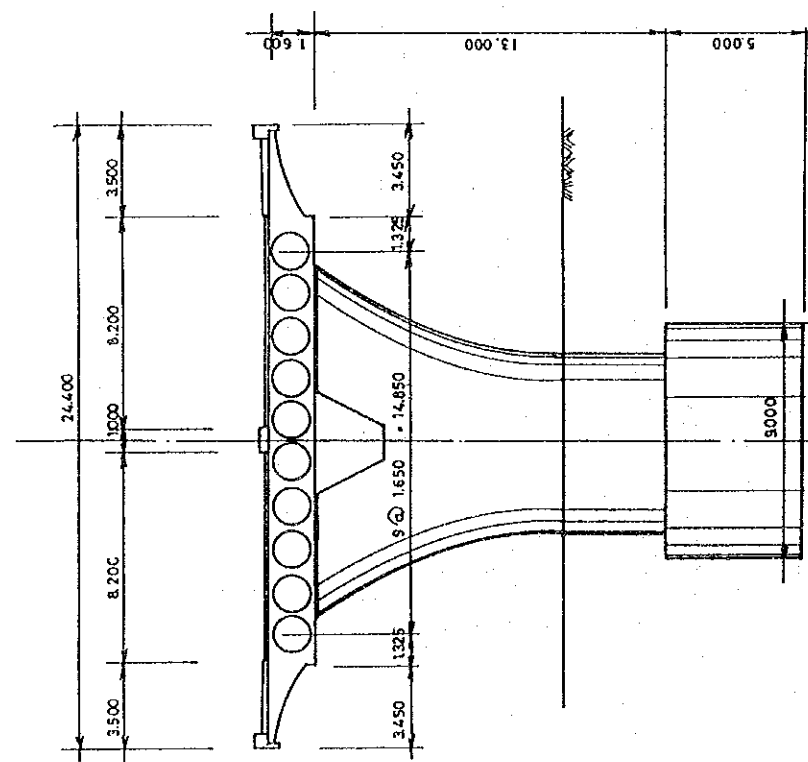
Continuous Post-tensioning Concrete Hollow-slab with Solid Wall Pier on Caisson Foundation
